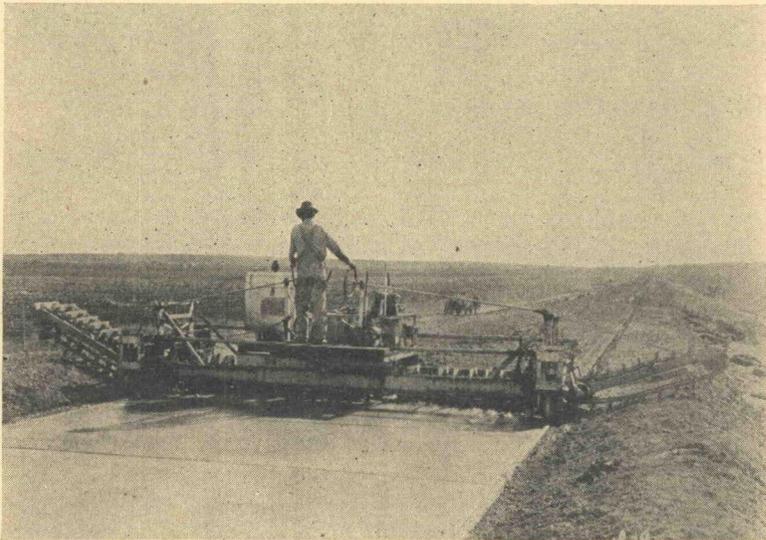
Earth Covering Machine for Curing Concrete Pavements
